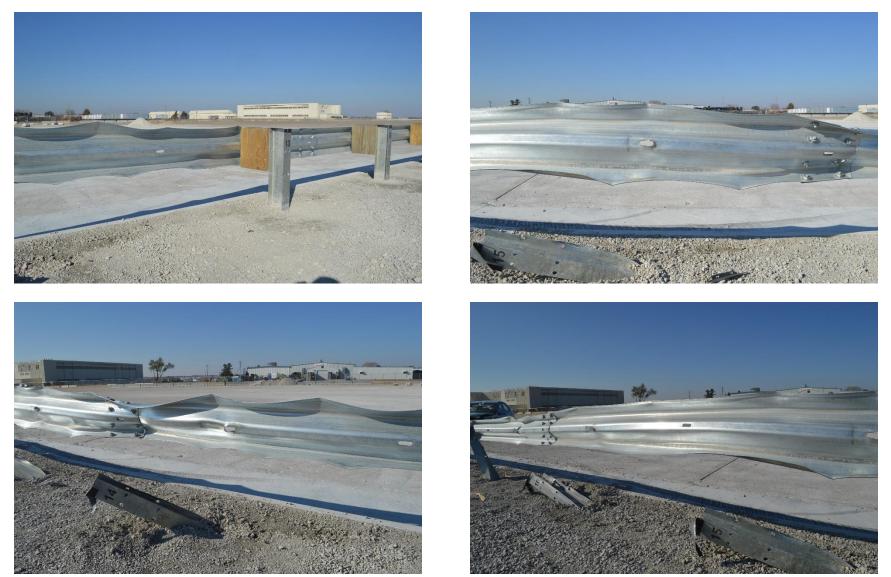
Backside Guardrail Damage, Post Nos. 13 through 16, Test No. MGSC-7
